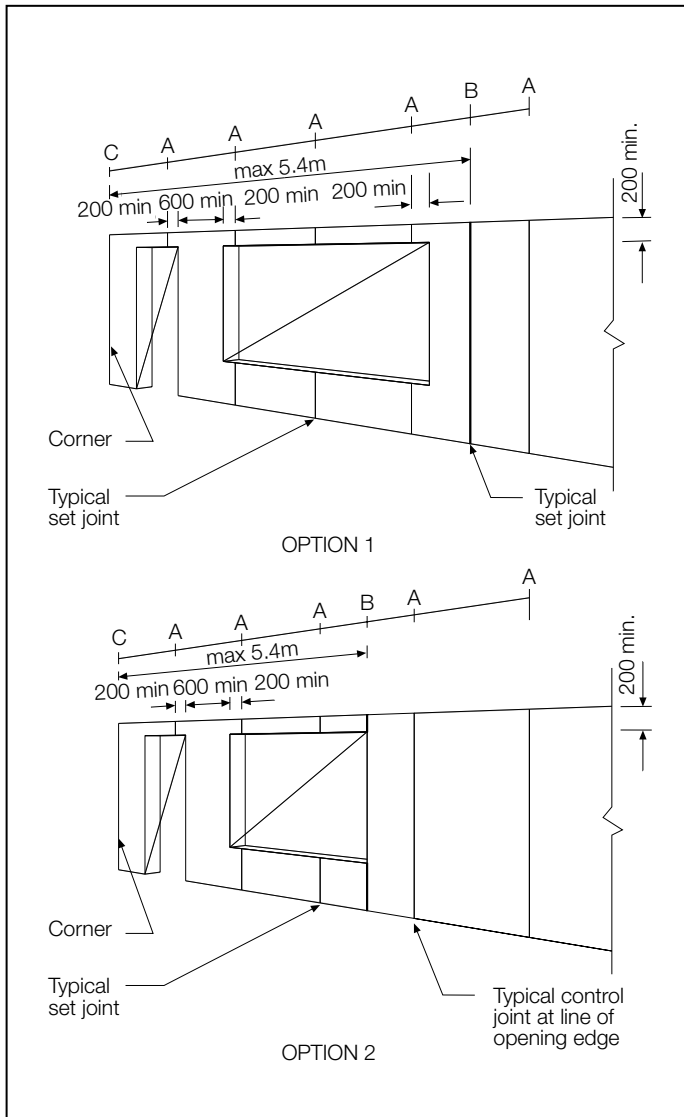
SHEET LAYOUT AROUND OPENINGS
